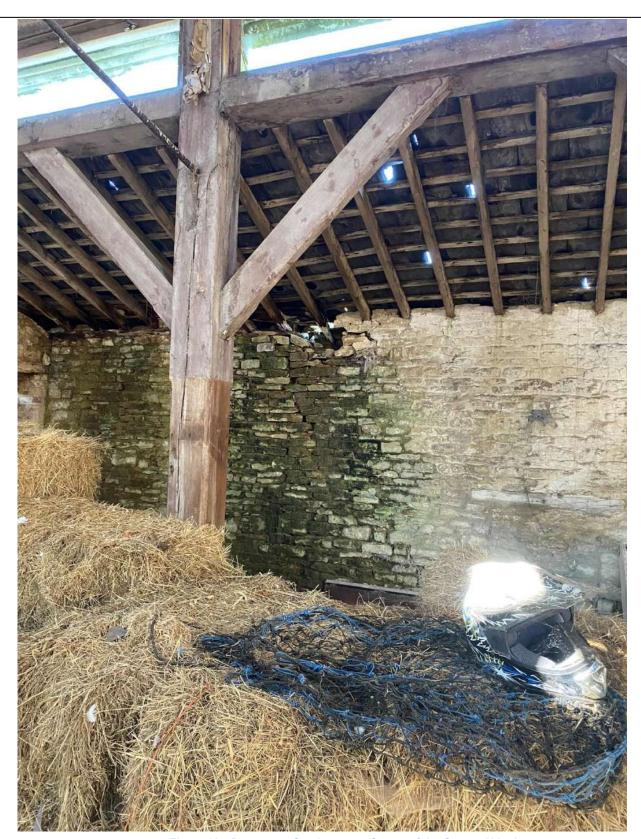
Damage to Southwestern Corner of the Covered Yard
